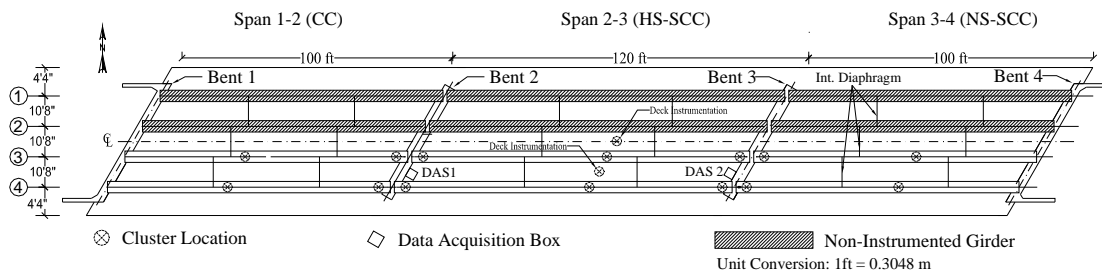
Bridge A7957's Instrumented Girders and Clusters' Locations
